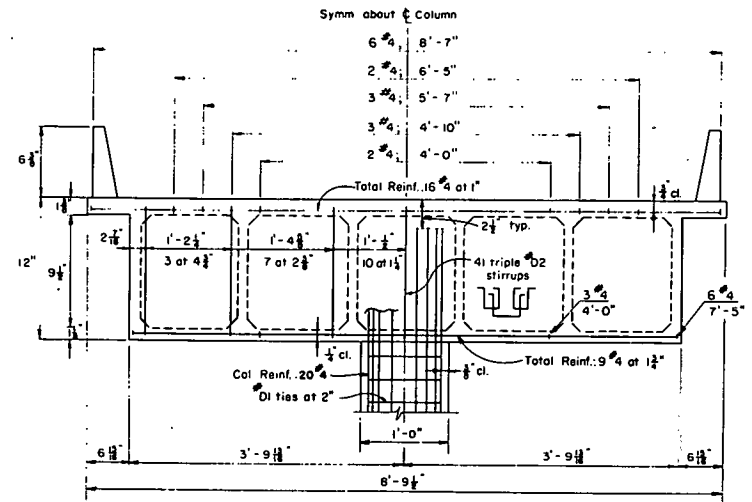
Bent Cap Reinforcement in Single-Column Model Bridges
